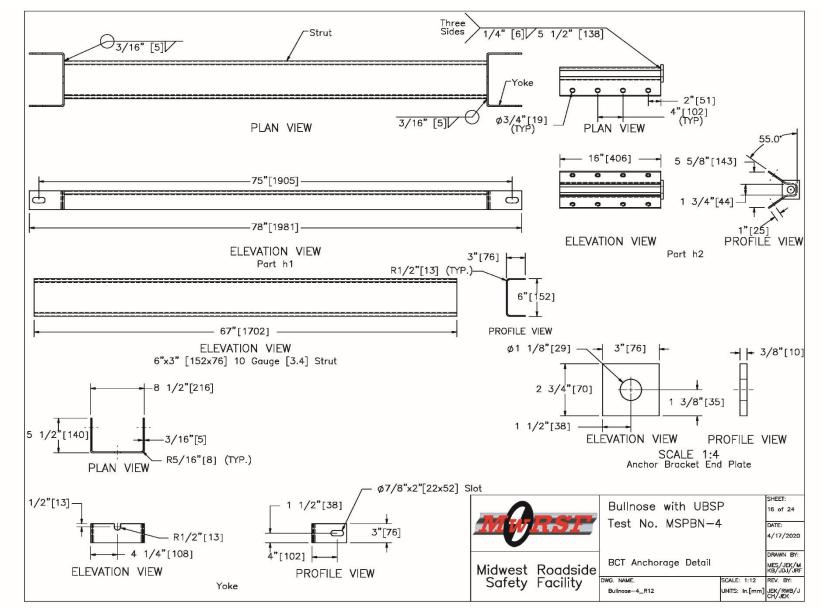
BCT Anchorage Detail, Test No. MSPBN-4
